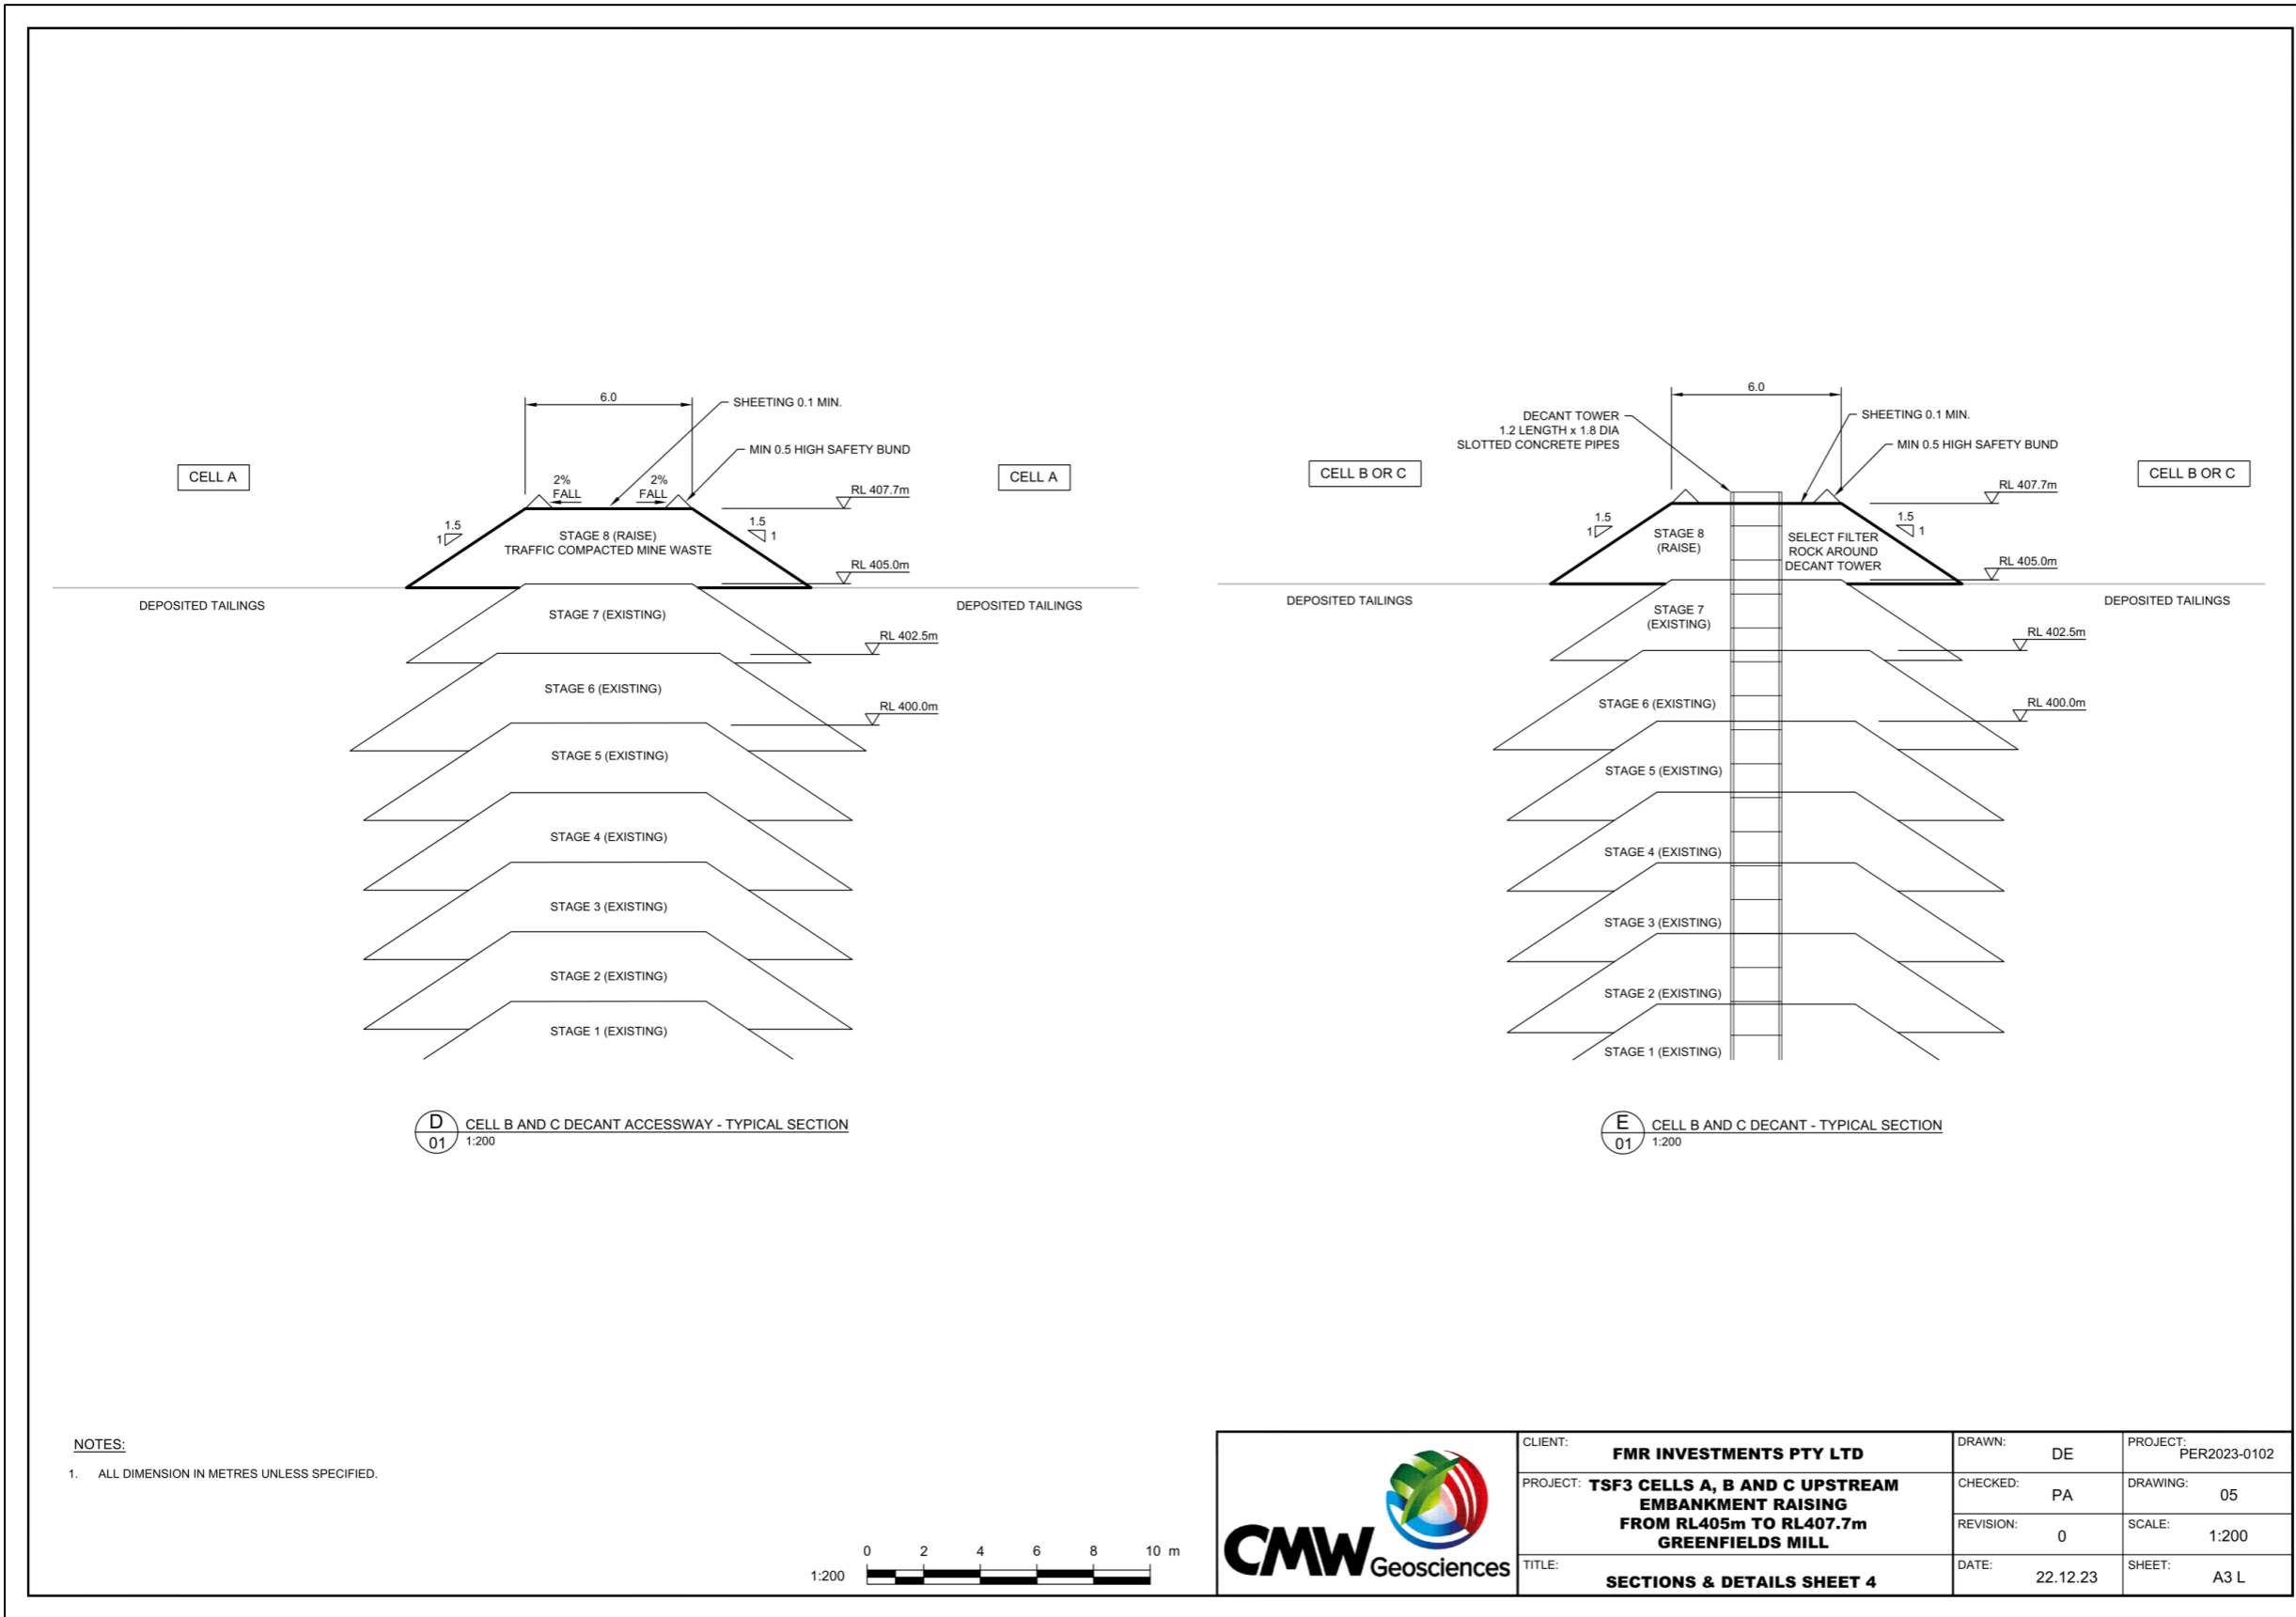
Design drawing (cross-section) for TSF3 Cell B and Cell C Stage 8 embankment raise – decant structure and accessway
